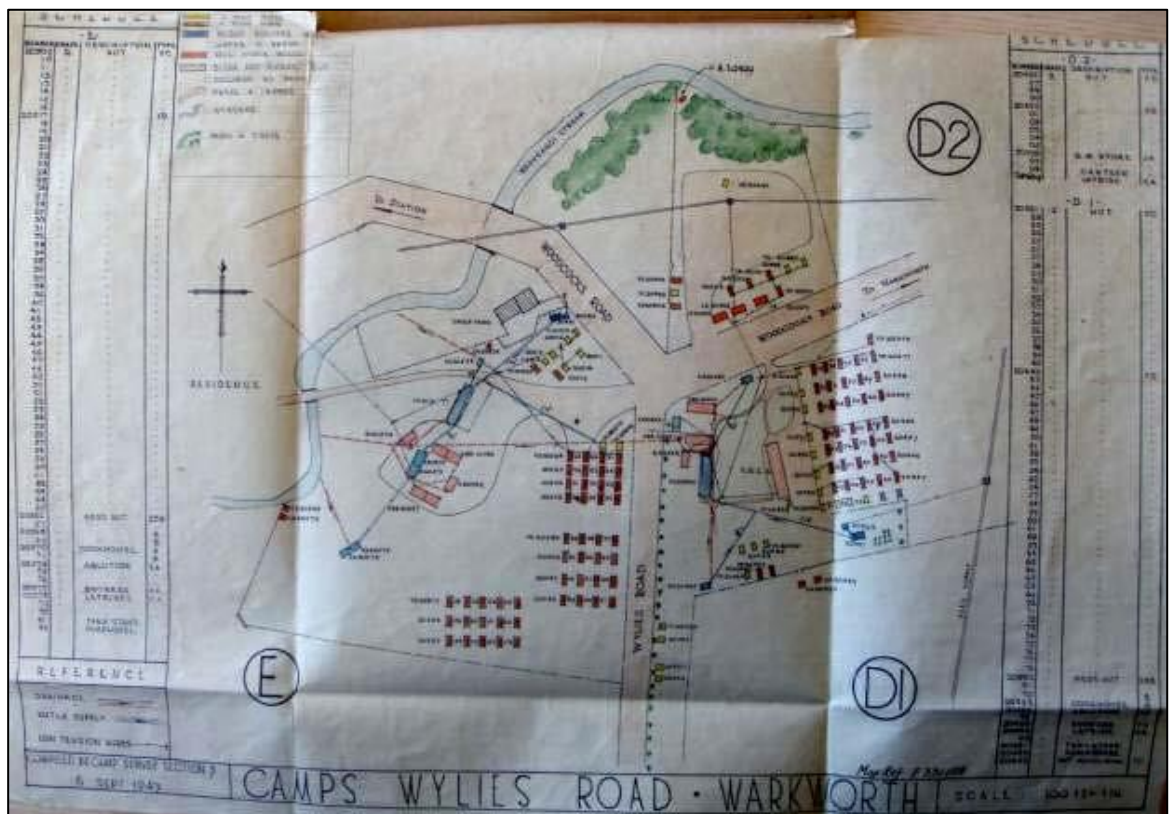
Plan detailing the layout of Wylies Road Camps D1, D2, and E, situated near the intersection of Wylie and Woodcocks Roads (source: Archives New Zealand, ACIO 8722, 6/ 73)
